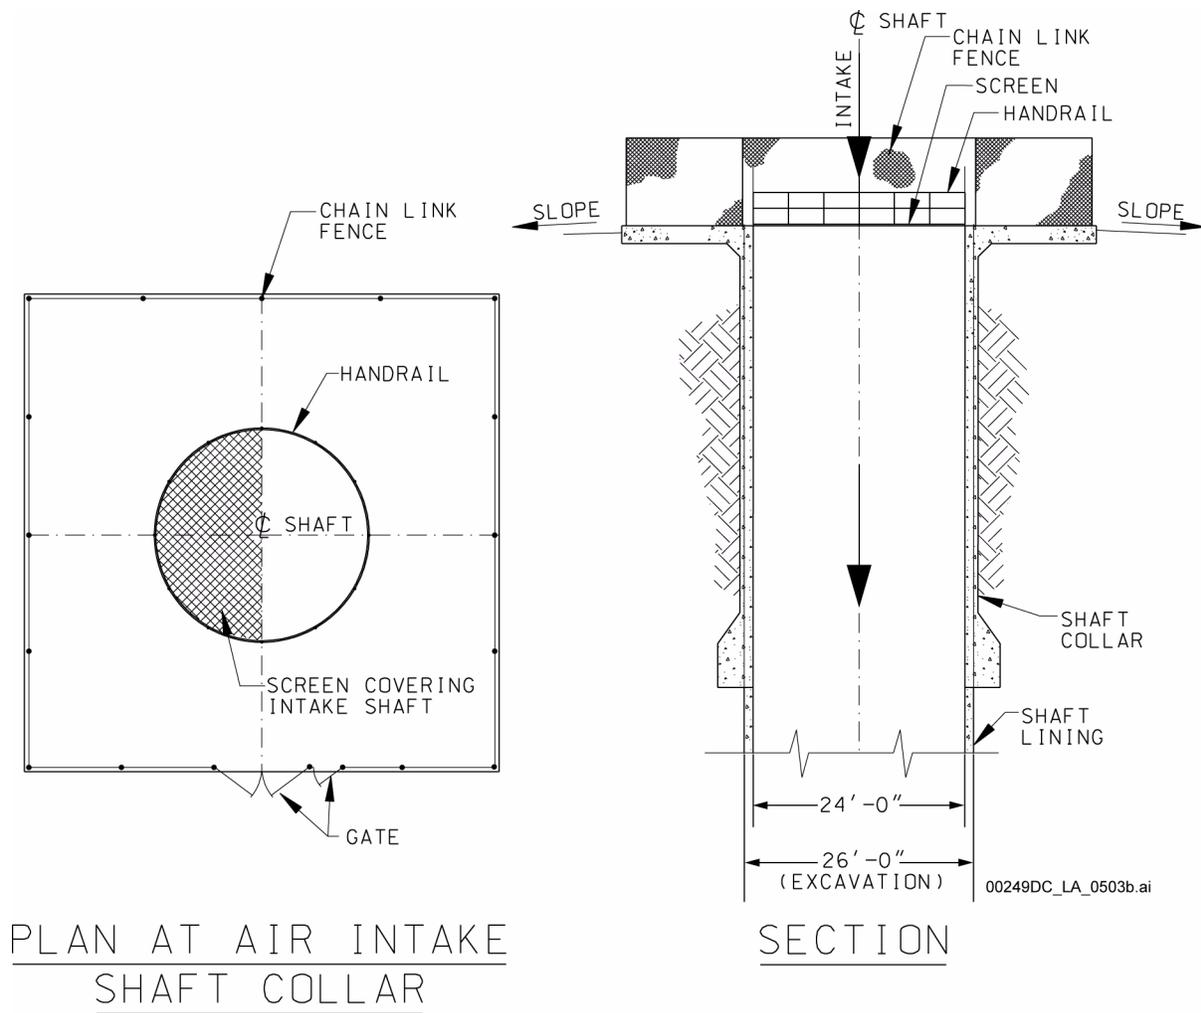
Typical Intake Shaft Configuration, Section and Plan View
